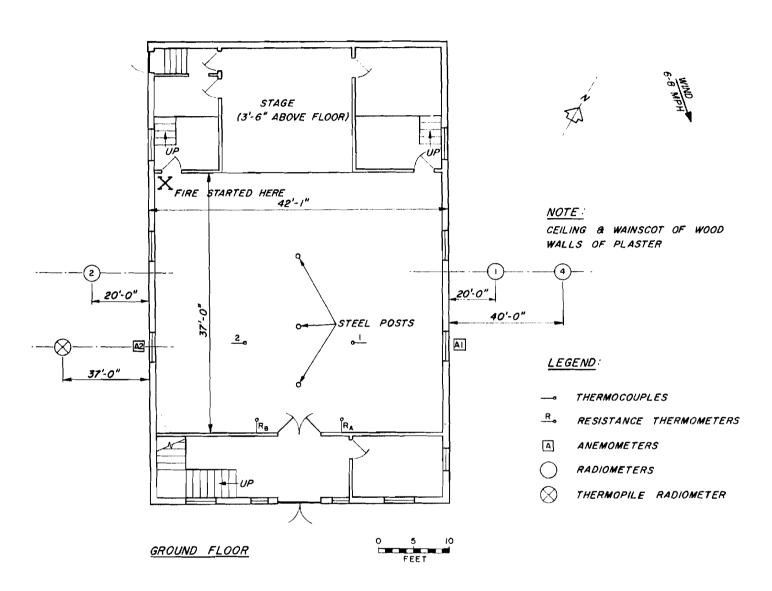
BUILDING No. 6 - TWO - STOREY SOLID BRICK FRATERNITY HALL
